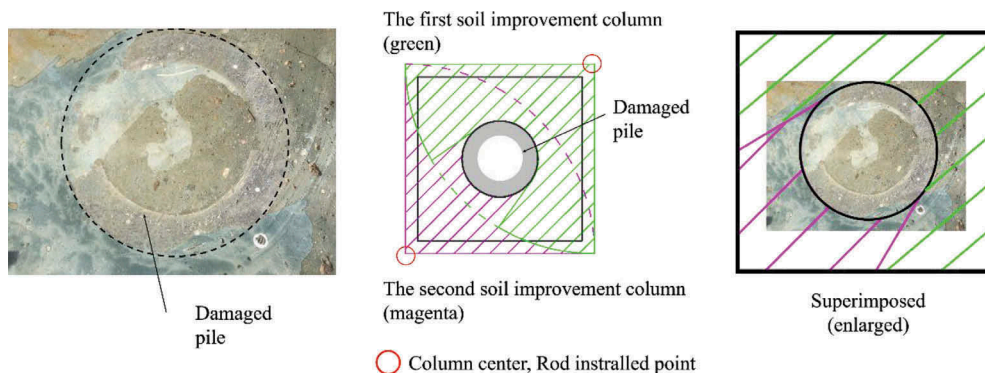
Photo and plan view of the damaged pile reinforced by soil improvement columns (GL -0.5m) after jet grouting (by mechanical cutting)
